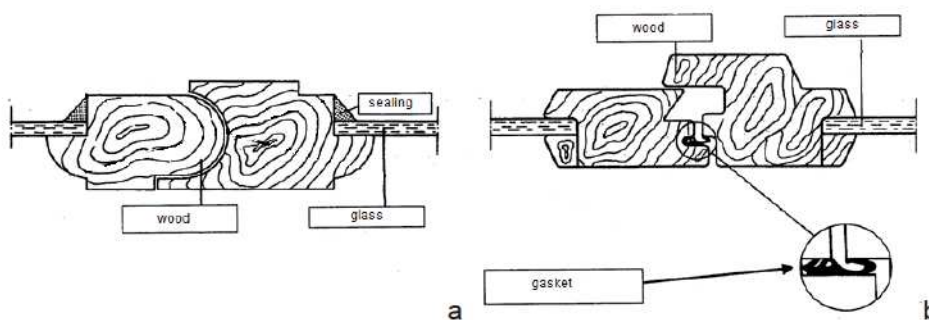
Window movable joint sealing. a) Without gaskets, b) With gaskets
